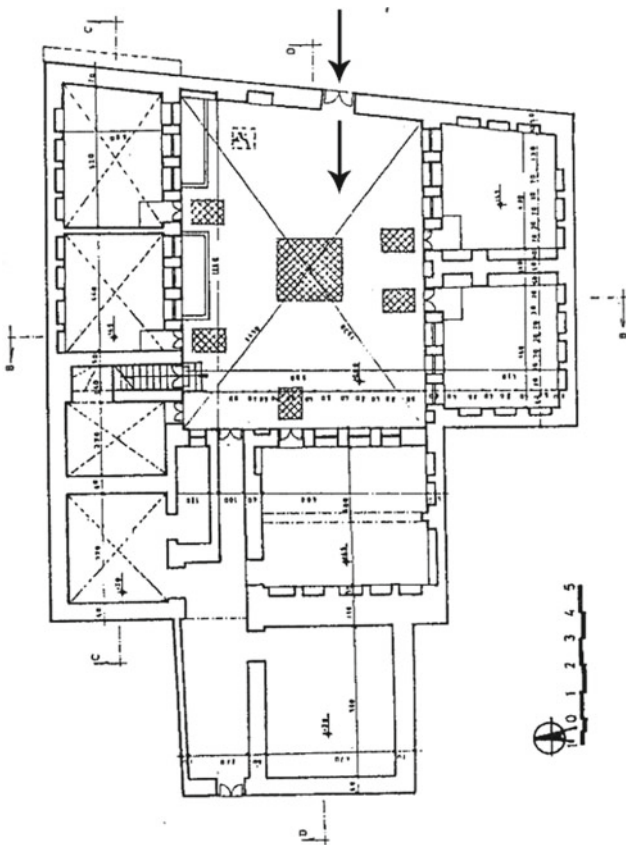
Dawama House—Ground Floor Plan—shows the direct opening to the entrance (Taftaq 1995)
